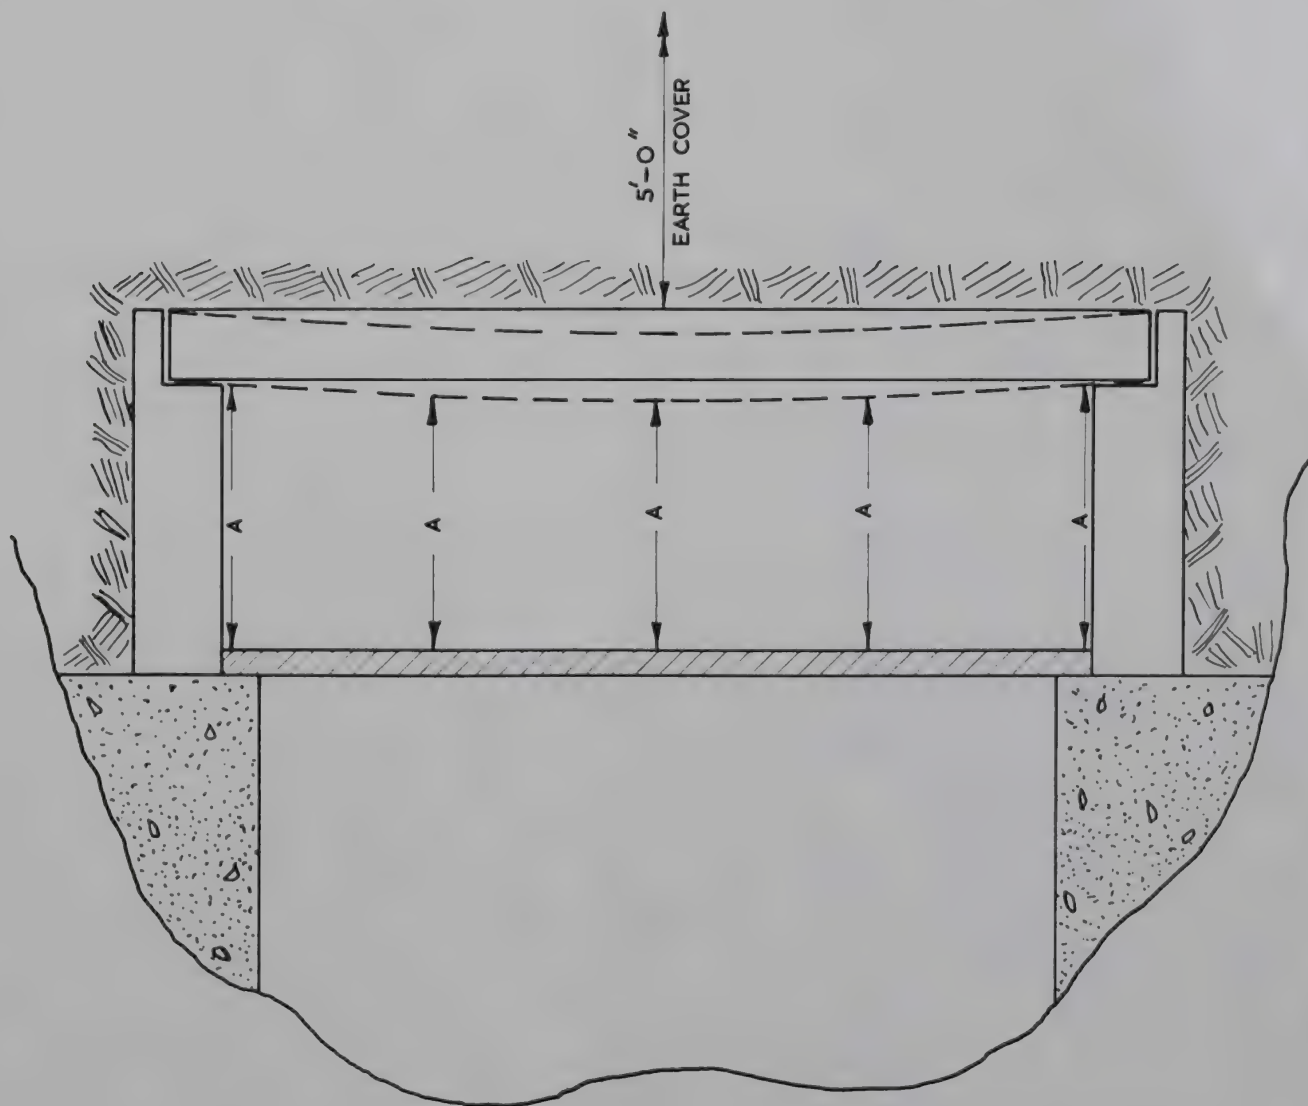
SKETCH SHOWING METHOD OF MEASURING
